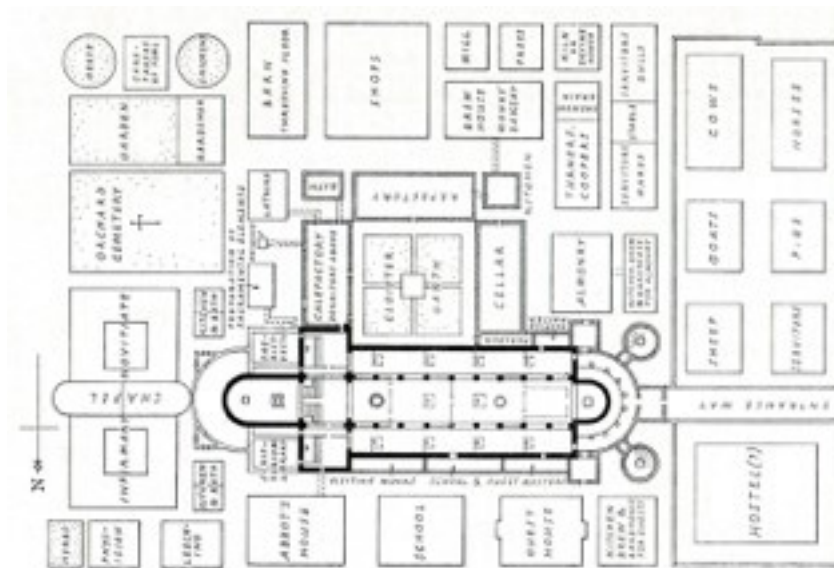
St. Gall Floor Plan as an example of Spatial Timelines.
